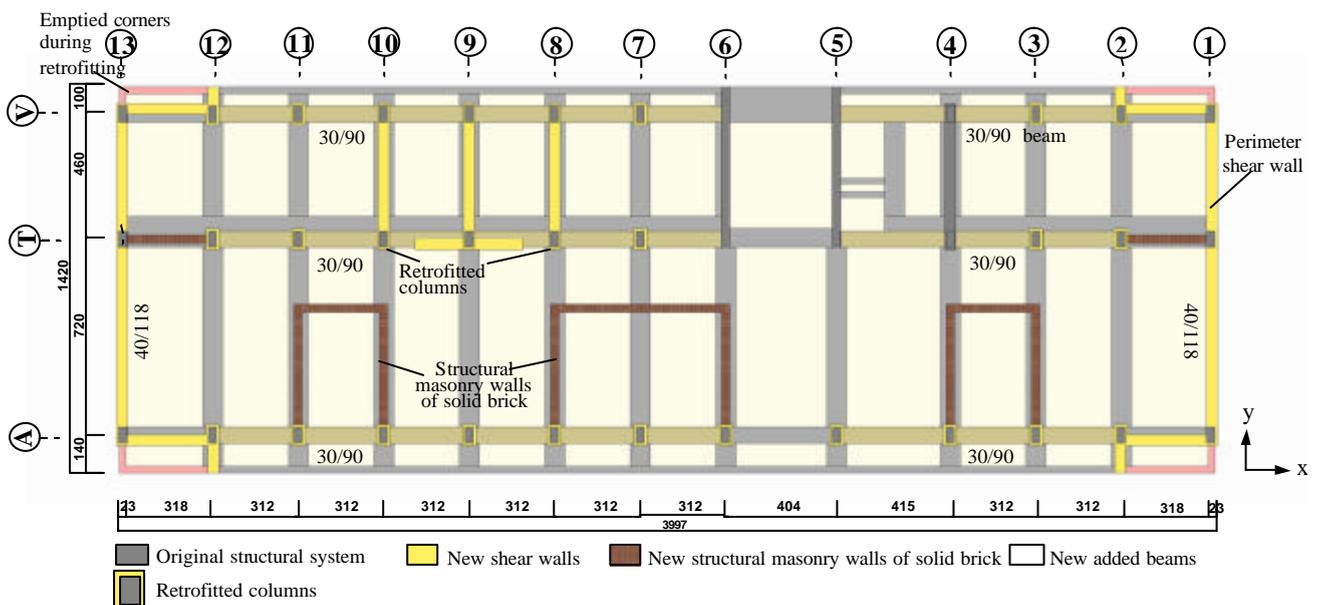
Main strengthening and repair works applied to Adapazari City Hall (the ground floor framing plan)
